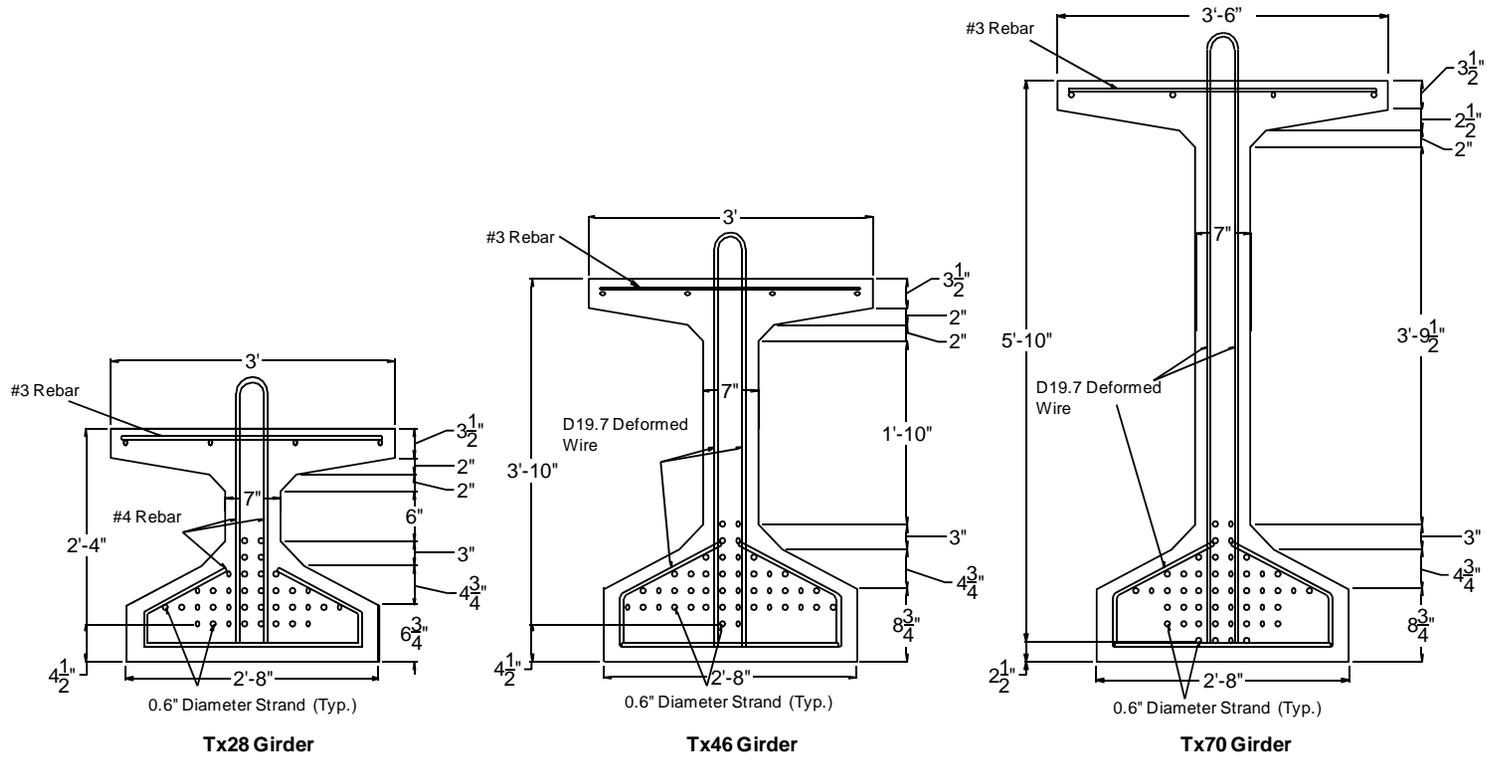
Tx Girder Cross Sections (O'Callaghan 2007)
